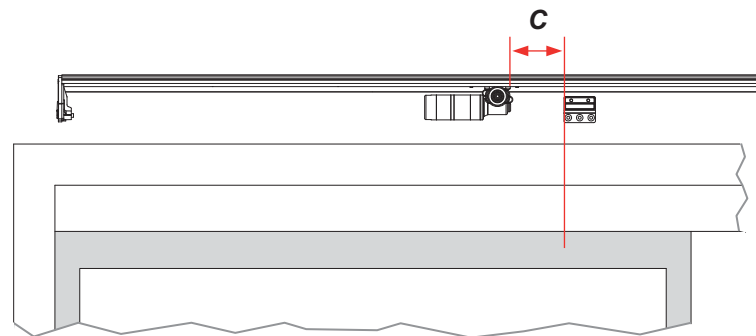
Left-opening sliding door with motor and bottom bracket. The left side is shown with the sliding door open.
